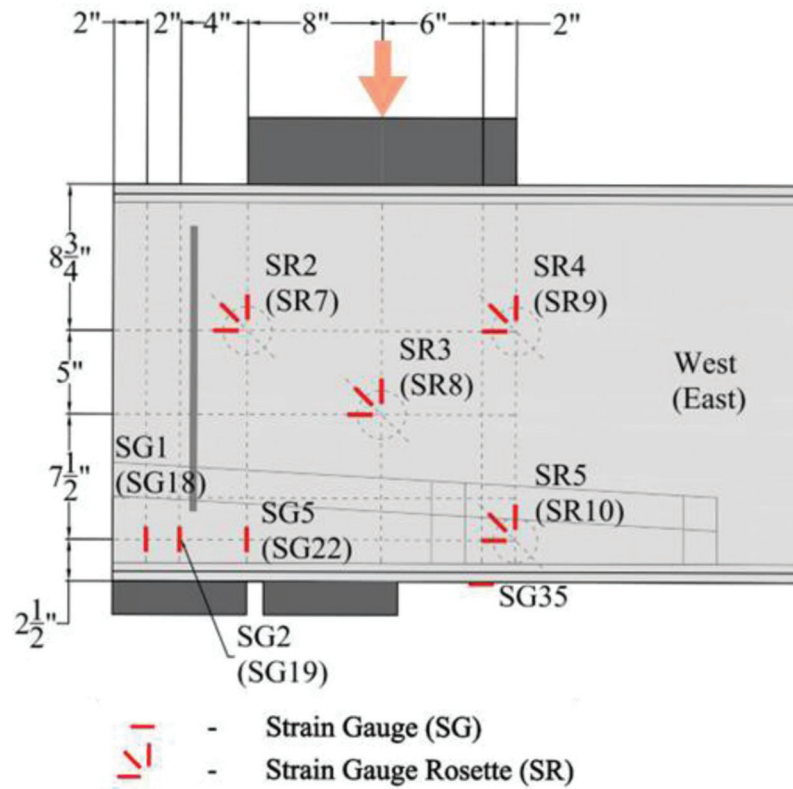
Strain gauge layout (side elevation): Specimens 4 and 5.
